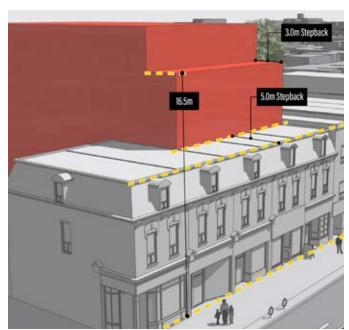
New development and additions above the primary structure of contributing properties shall provide a minimum stepback of 5.0 metres from the streetwall fronting onto Queen Street West.
